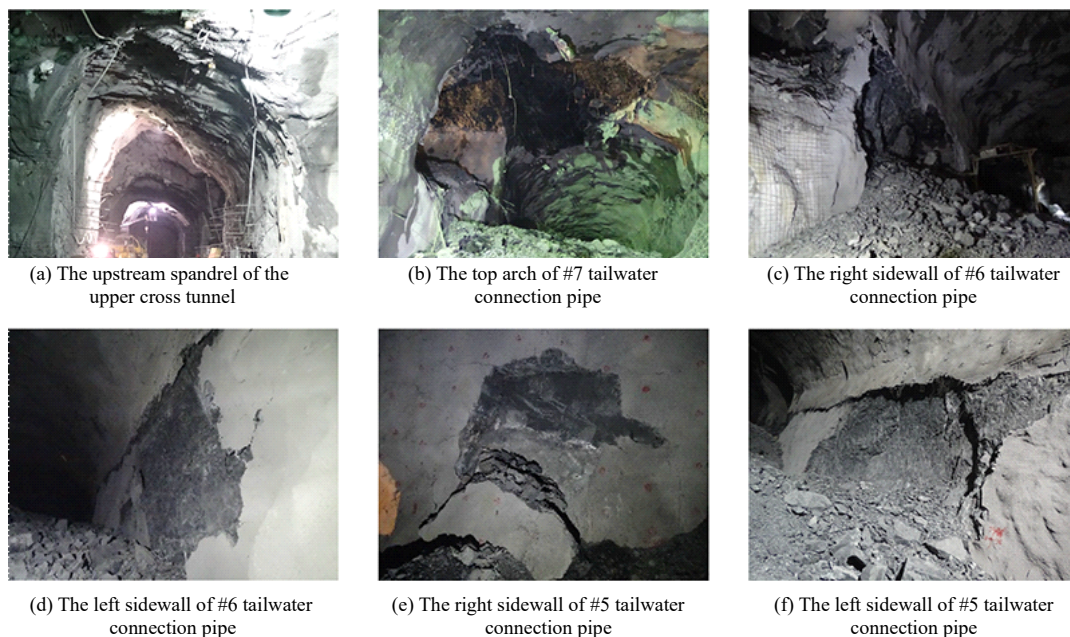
Typical failure of columnar jointed rock masses around tailwater connection pipes
